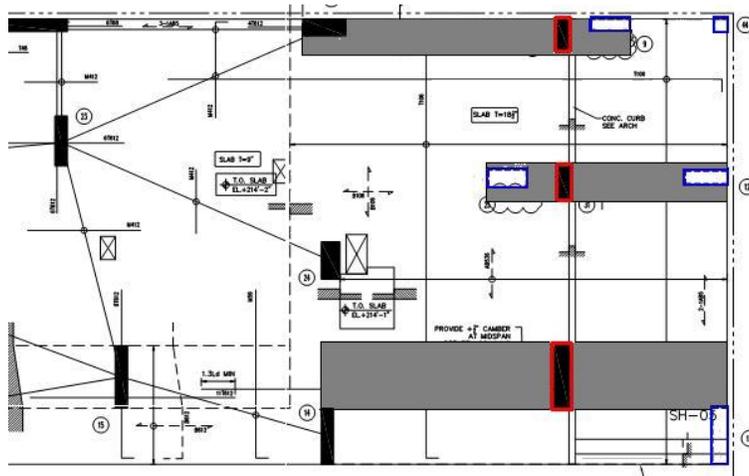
Schematic beam layout on 19th Floor with red denoting terminated columns and blue denoting new column locations on 18th level below
